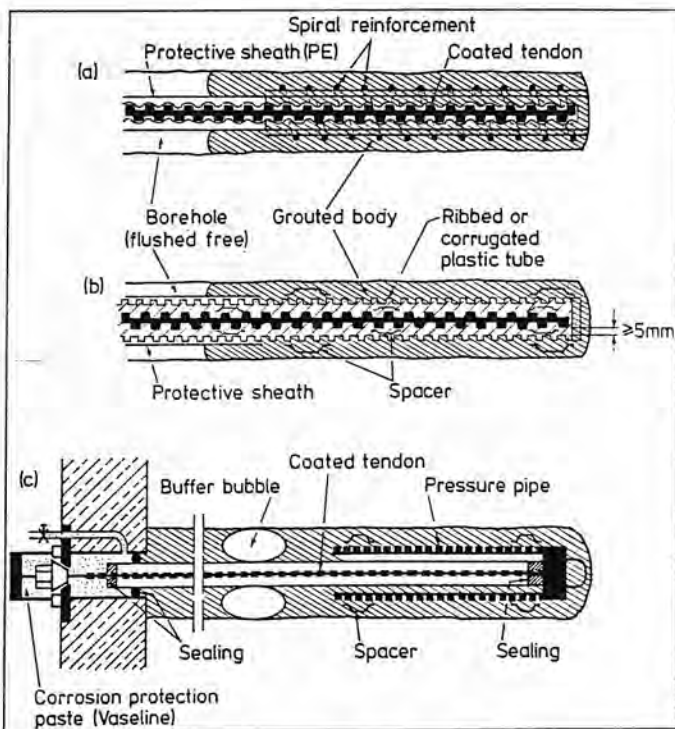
Permanent anchor constructions; (a) Type A with coated tendon; (b) Type A with ribbed plastic tube; (c) Type B with pressure pipe (after Ostermayer, 1974)
